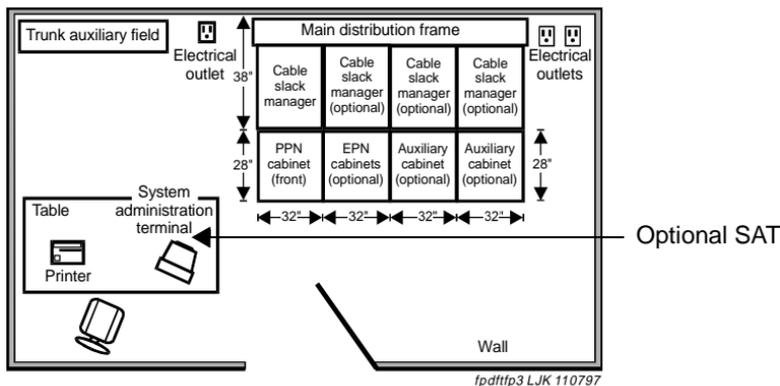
Typical Floor Plan with an additional EPN and Auxiliary Cabinets
